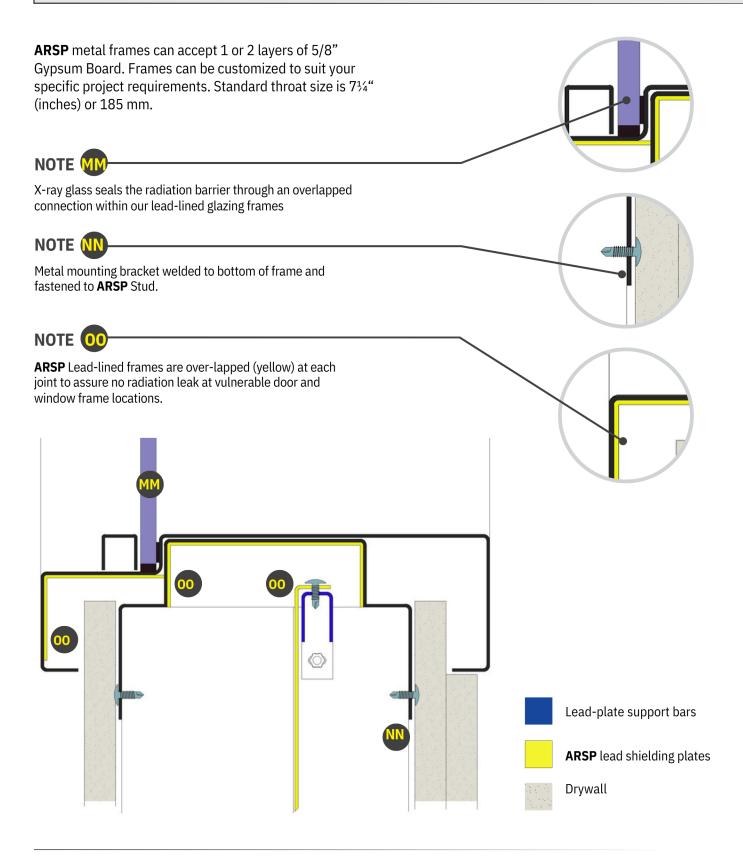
ARSP GLAZING FRAME - SECTION VIEW, SILL
